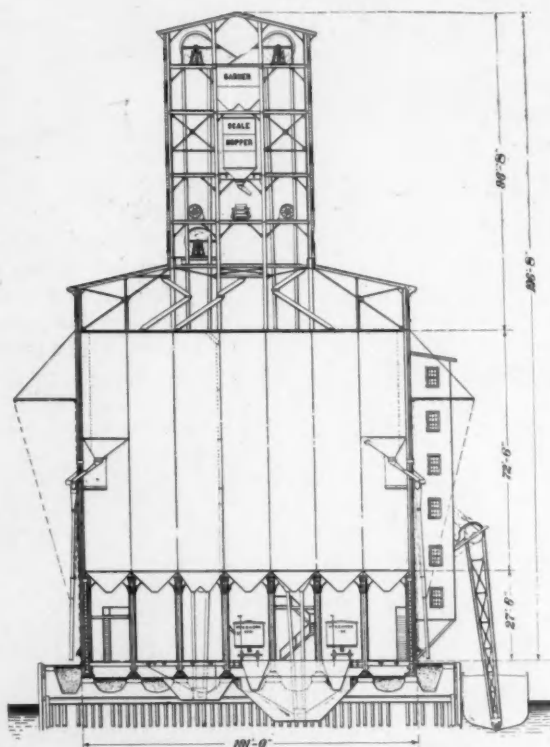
CROSS SECTION OF ELEVATOR FOR WEST SHORE RAILROAD, WEEHAWKEN, N. J. BUILT OF STEEL ENCLOSED WITH BRICK WALLS AROUND MAIN STRUCTURE AND HOLLOW TILES AROUND CUPOLA. ROOFS OF BOON TILE.
